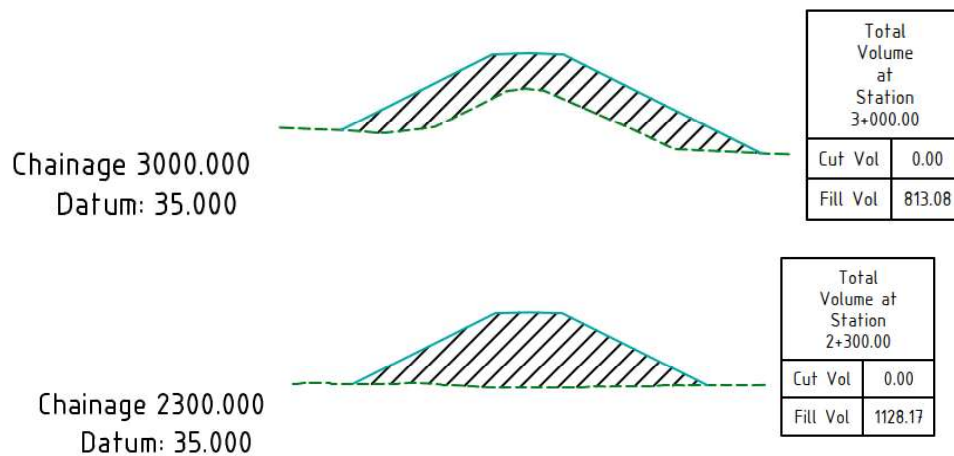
The proposed stopbank widening at the existing crest (top section) and where the alignment is in a new location (bottom section).
